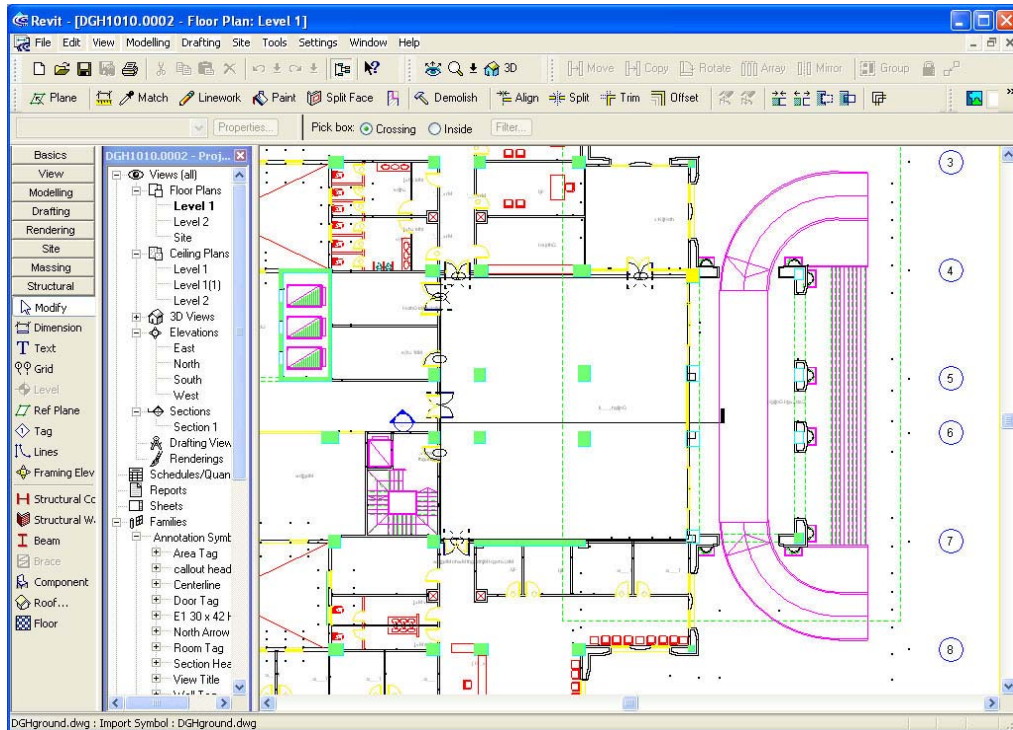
Ground floor plan of DGH hospital created using Revit
